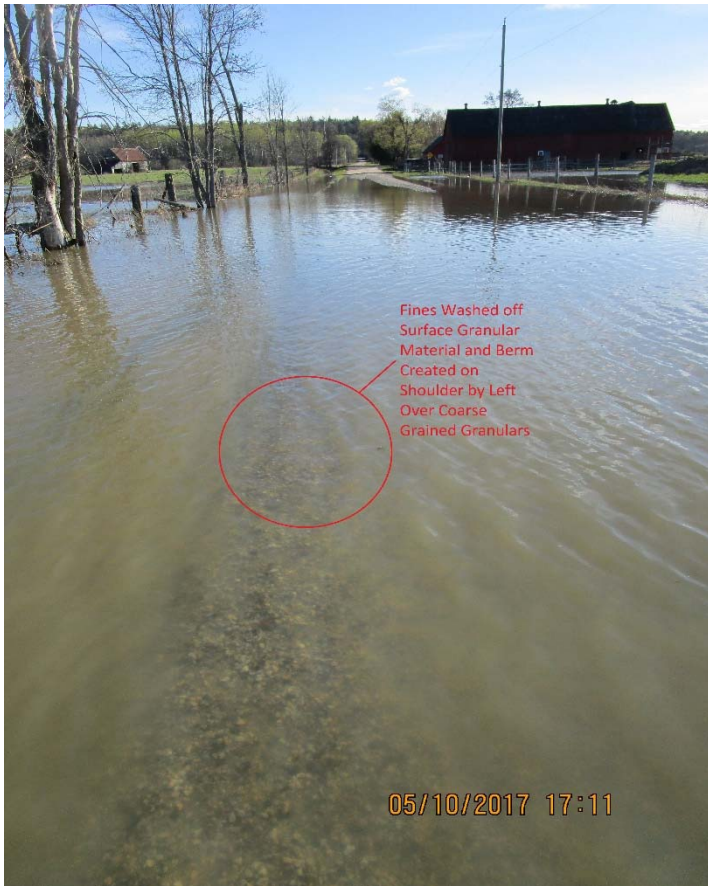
Photo of culvert flooded section depicting the fine granular's being washed off the road surface.
